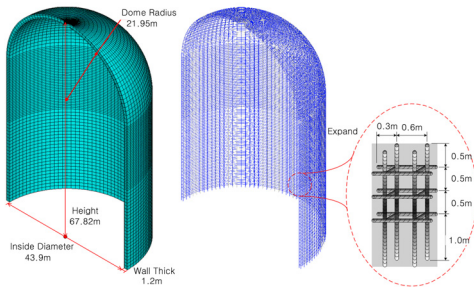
Specification of Containment Building, Finite Element Model of Steel and Concrete
